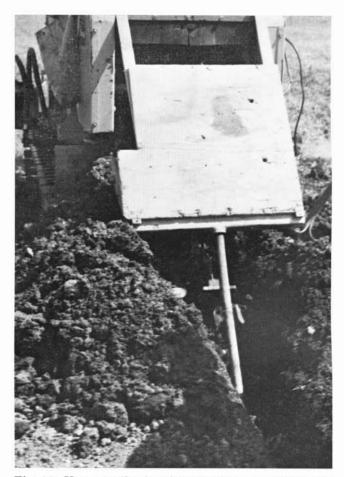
You can dig the pit wall with a small trencher and pour concrete with very little forming.
